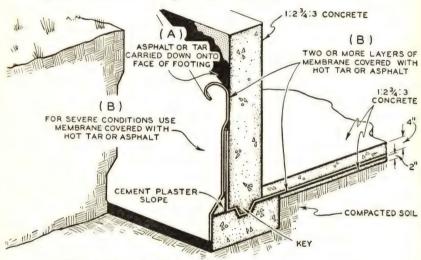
Method of Waterproofing Foundation against Severe Ground-Water Pressure
